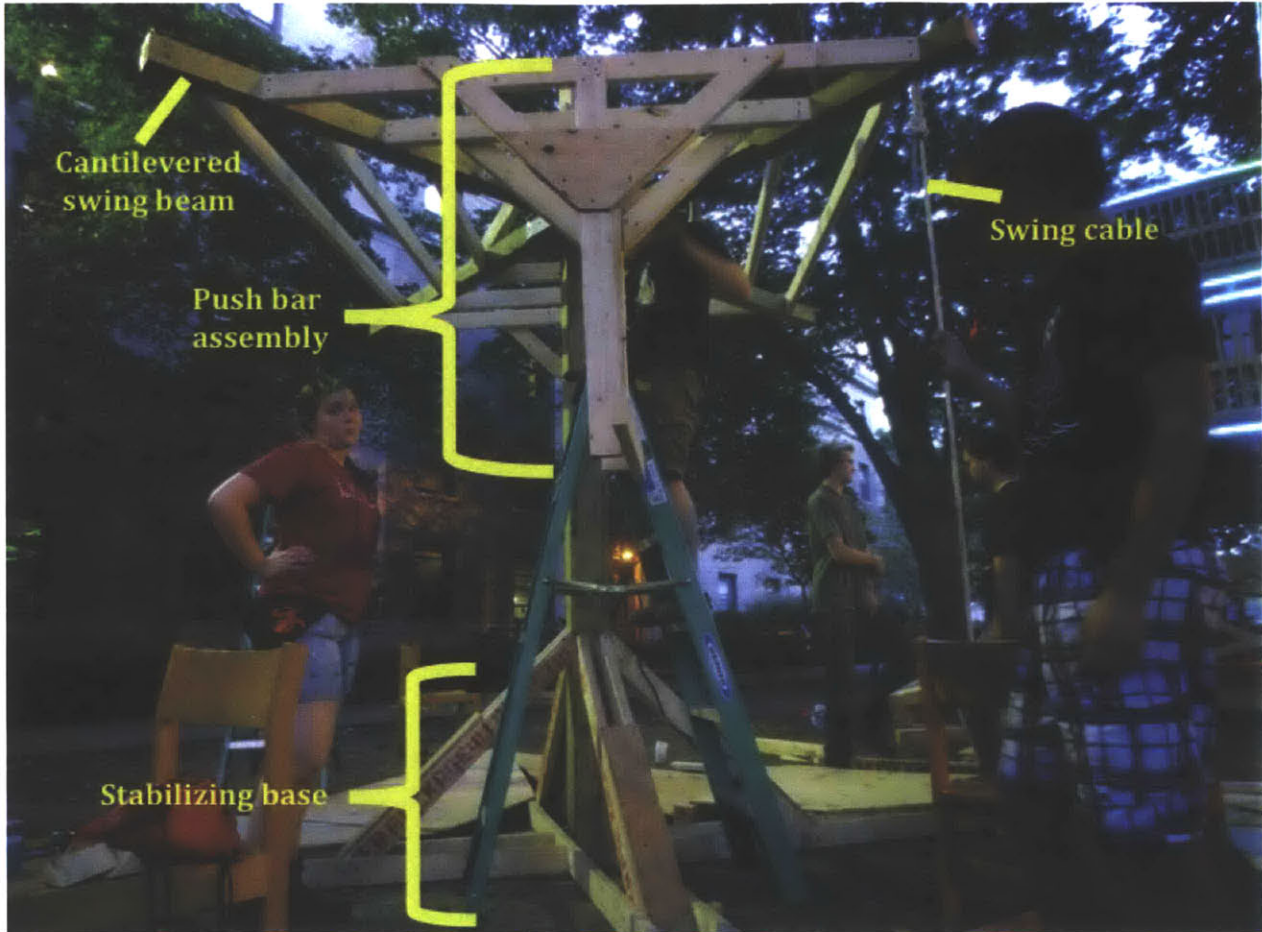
Swing and pusher bar assembly. Pusher bar is directly in the front of the image, nearly completed, with a trapezoidal gusset plate.
